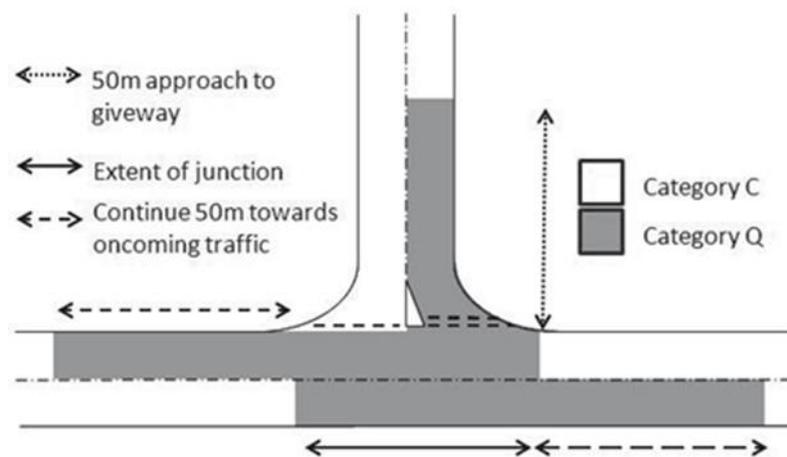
Site Categories for junction approaches on a single carriageway
